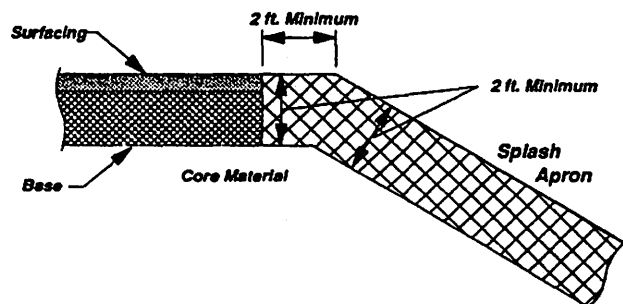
Detail cross section of joint between surface, base, and splash apron.
